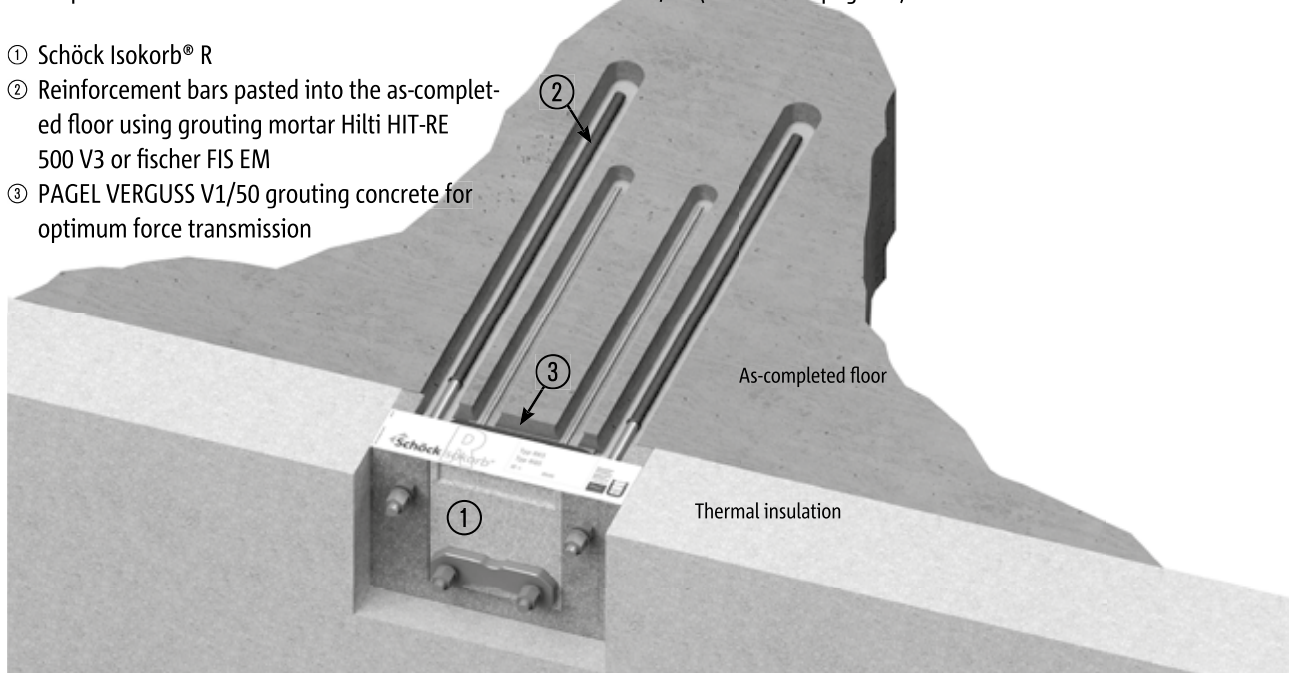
Installation situation: Schöck Isokorb® type RKS for the connection of reinforced concrete balconies to reinforced concrete floors
